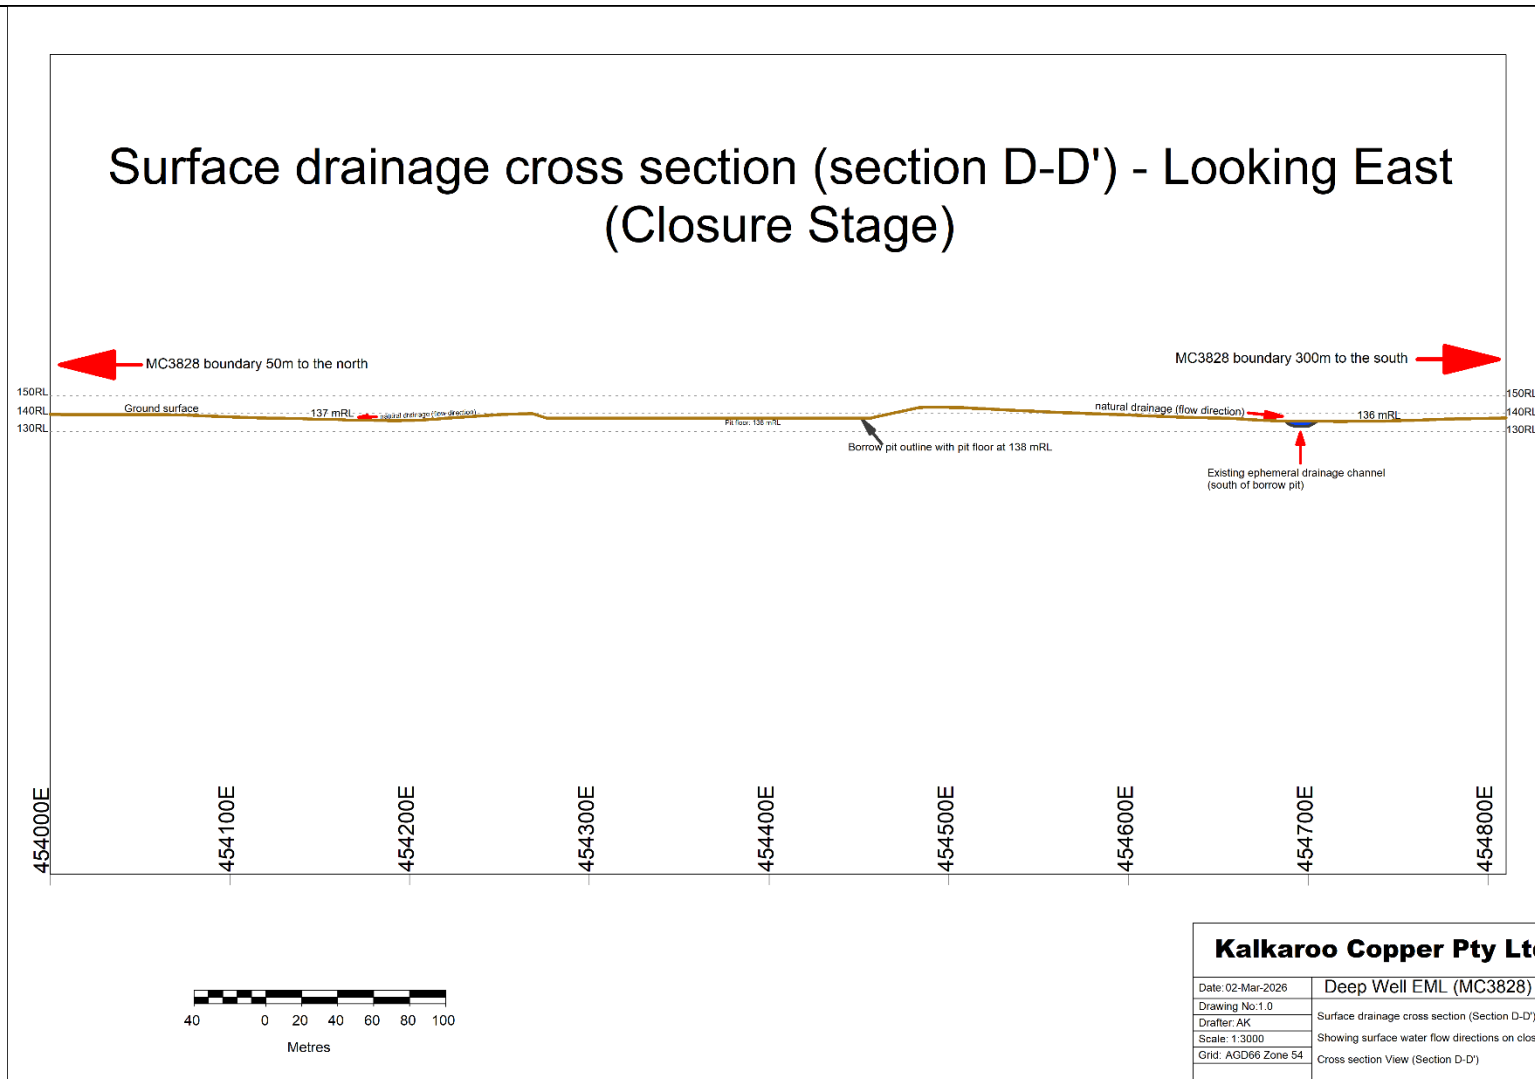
Crossover D-D' looking North through MC3828 showing RL of borrow pit to adjacent drainage
